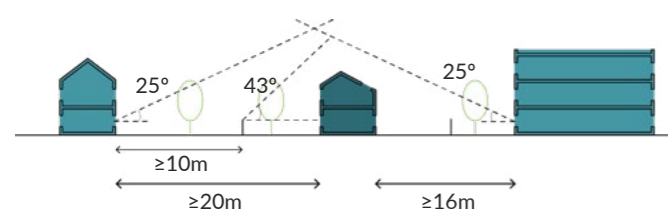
An example of off-street development in a Maintain area, where the flat roofed building is a host building. A closer, 16m separation distance between host and new building can be achieved through facing windows only being provided at ground floor with mitigating measures such as staggering windows to upper floors avoiding direct overlooking to neighbours.
